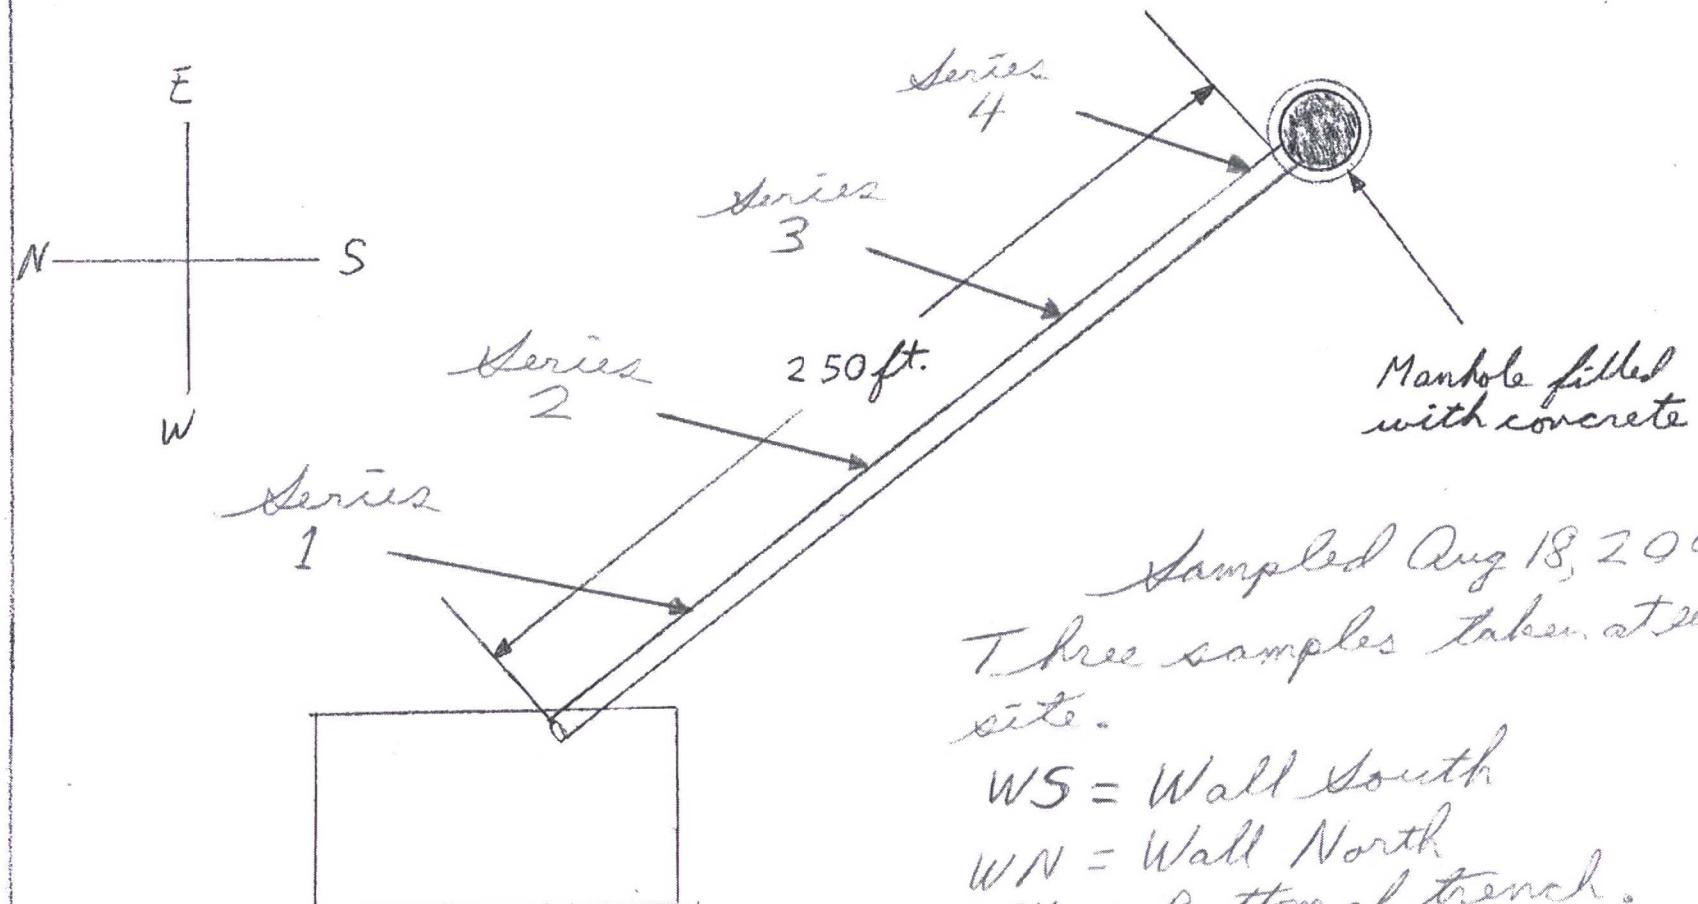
Pipe Sampling Locations, Drawing No. 11105-1
